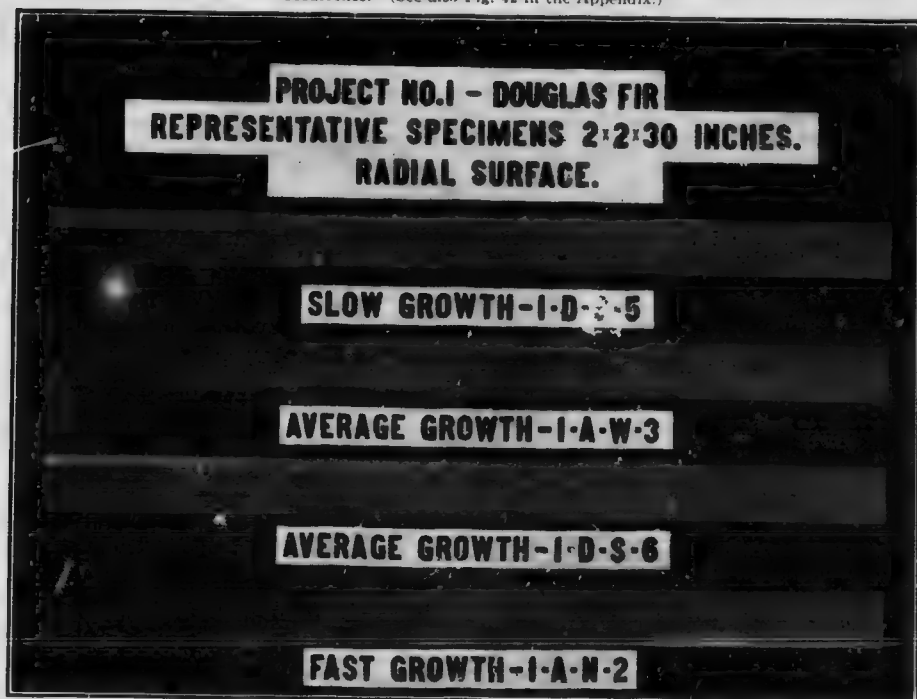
Radial surfaces of sticks shown in Fig. 4.
